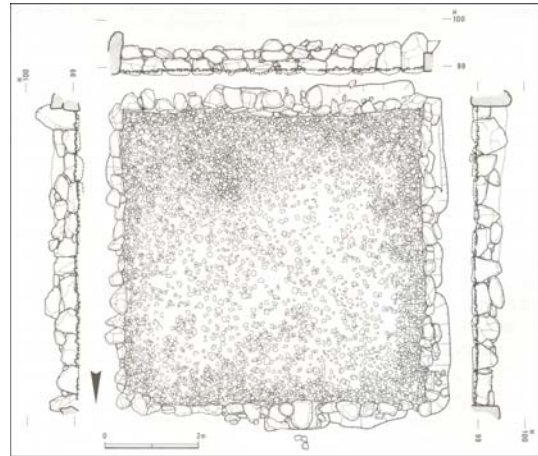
Shigami pond plan (North pond) (NNC, 1998).
